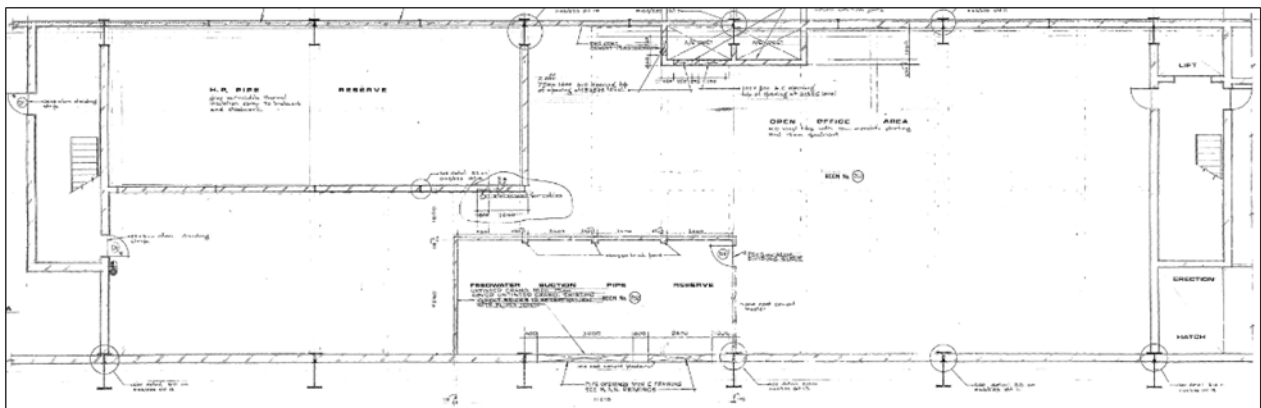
Plan layout of the 26m level within the auxiliary bay (extract from drawing no. 063/11126)
